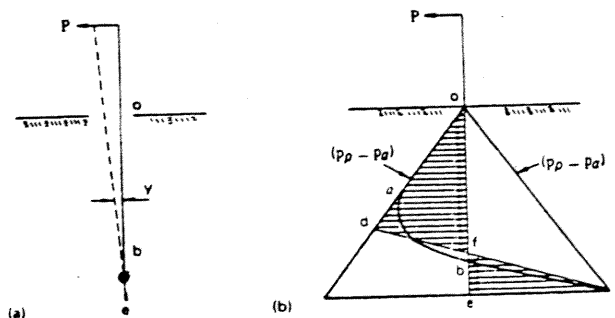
Earth pressure on cantilever sheet piling (after Teng<sup>1</sup>)
